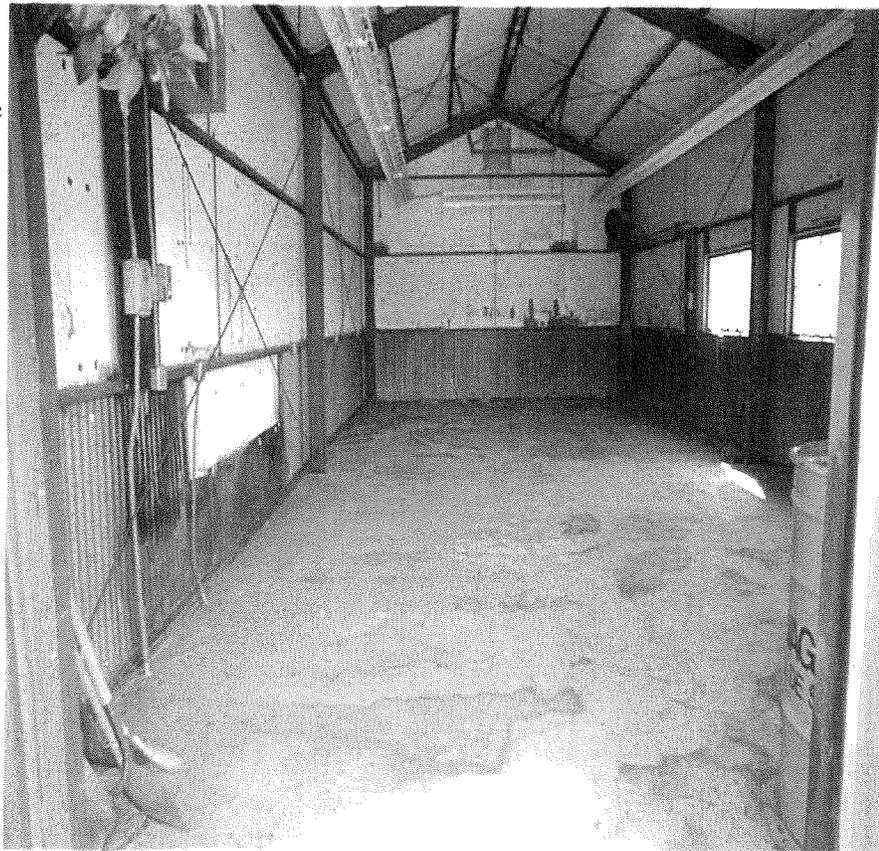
(Right): View inside Building T029, looking East. Size of building is 20 ft x 40 ft.
